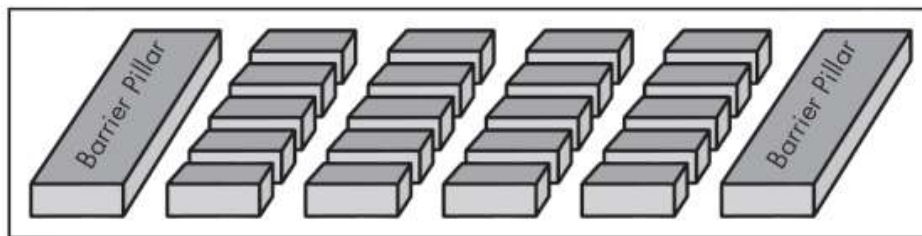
showing Room-and-Pillar mining layout with five entries (Darling 2011)
